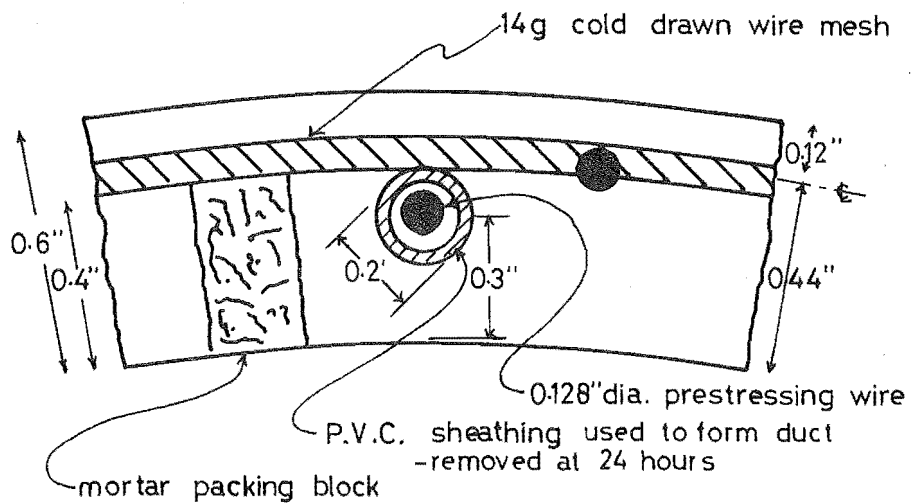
TYPICAL SHELL CROSS-SECTION
